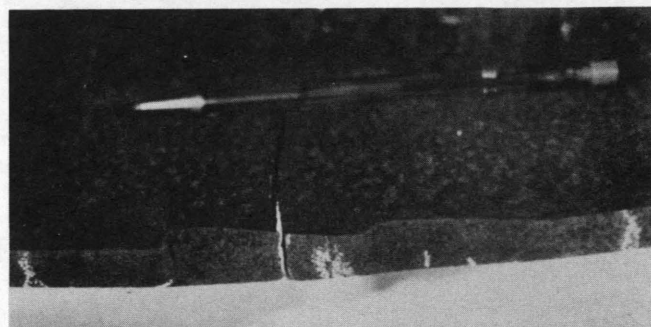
Crack in bottom flange of Girder SB-7.
